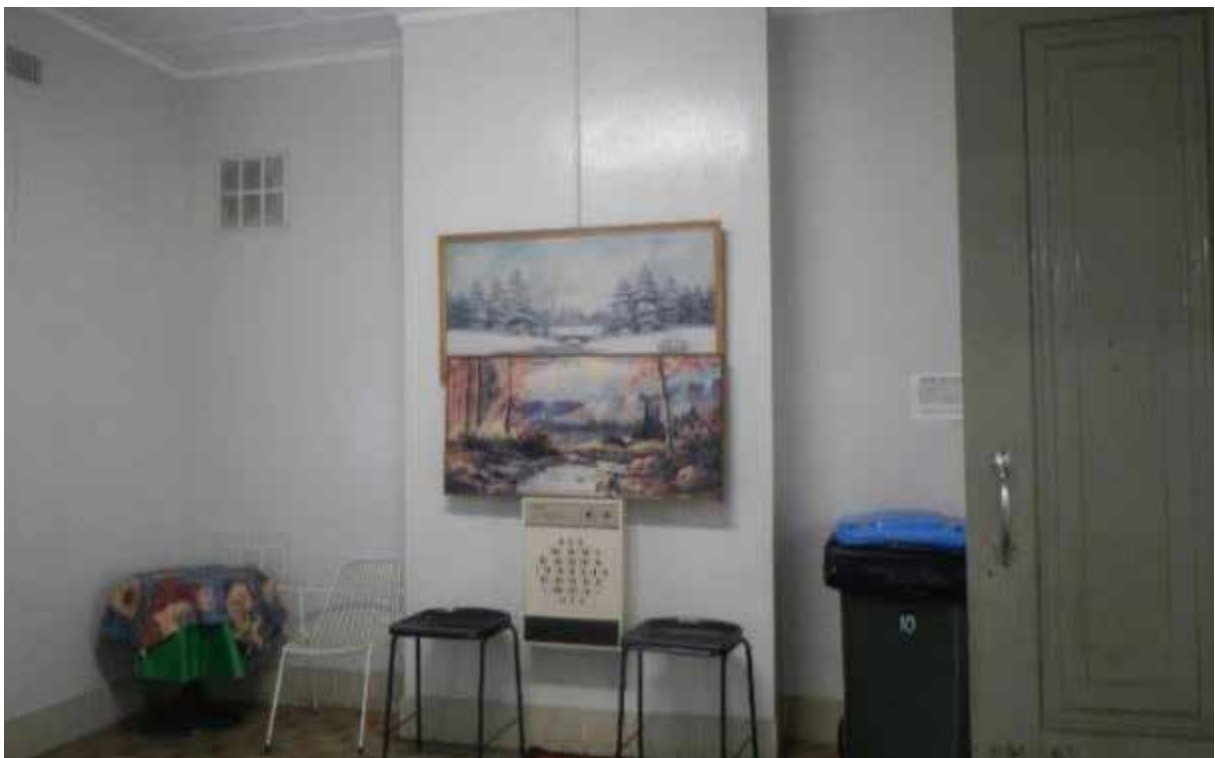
Internal wall in Ladies Waiting Room proposed to be removed to allow for larger waiting room
